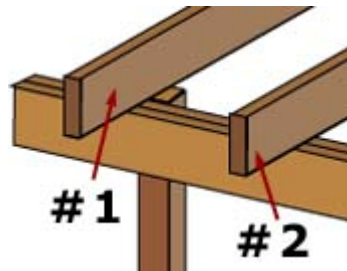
Image G: Numbering your rafters will make steps 1 through 4 of "Installing Brace Blocks" much easier.
